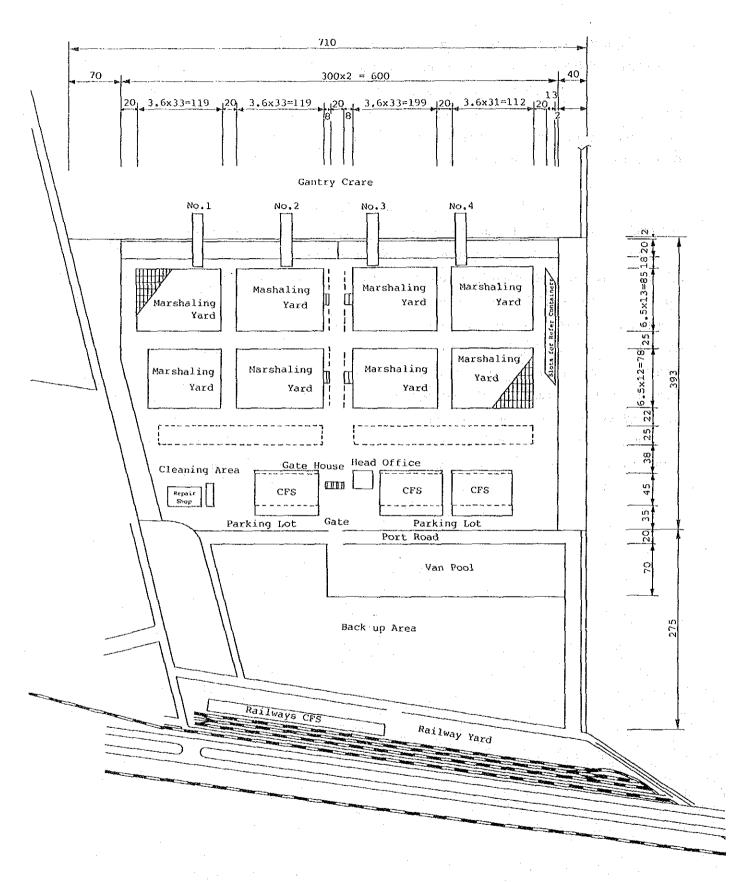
Layout Plan of the Main Facilities in Case 2-1 (Straddle Carrier System)
